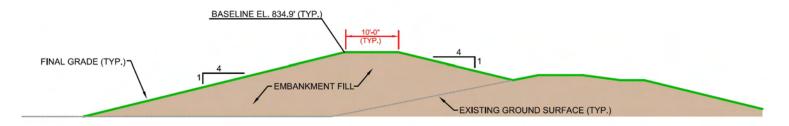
Tellico Dam – Raised Embankment Concept for Segment T-1 (Canal Saddle Dam)
